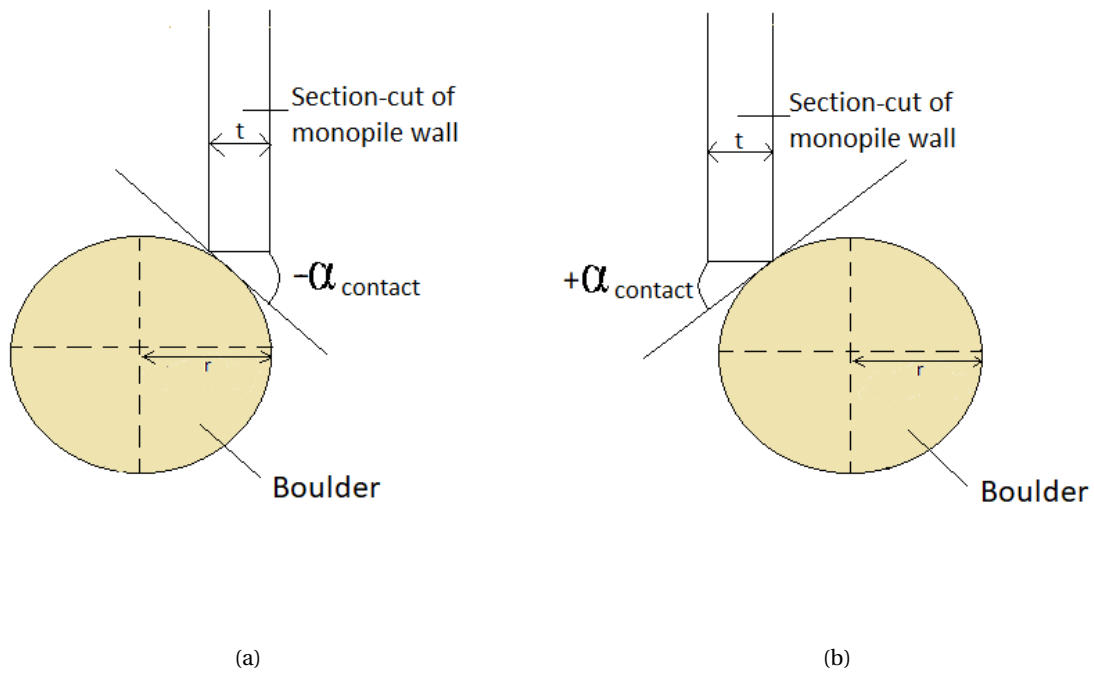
(a) Boulder's centre located inside the pile. (b) Boulder's centre located outside the pile. (a) and (b) show different locations of the boulder under one side of the pile, forcing asymmetric loading on the pile.
